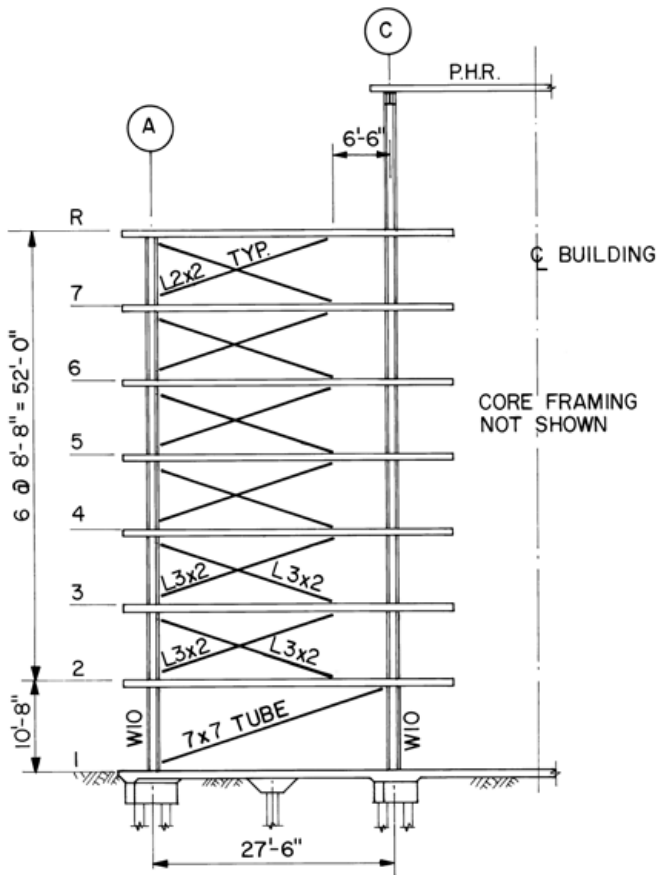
Schematic radial cross-section of hotel tower at a typical braced frame. Framing for core of building is not shown.
